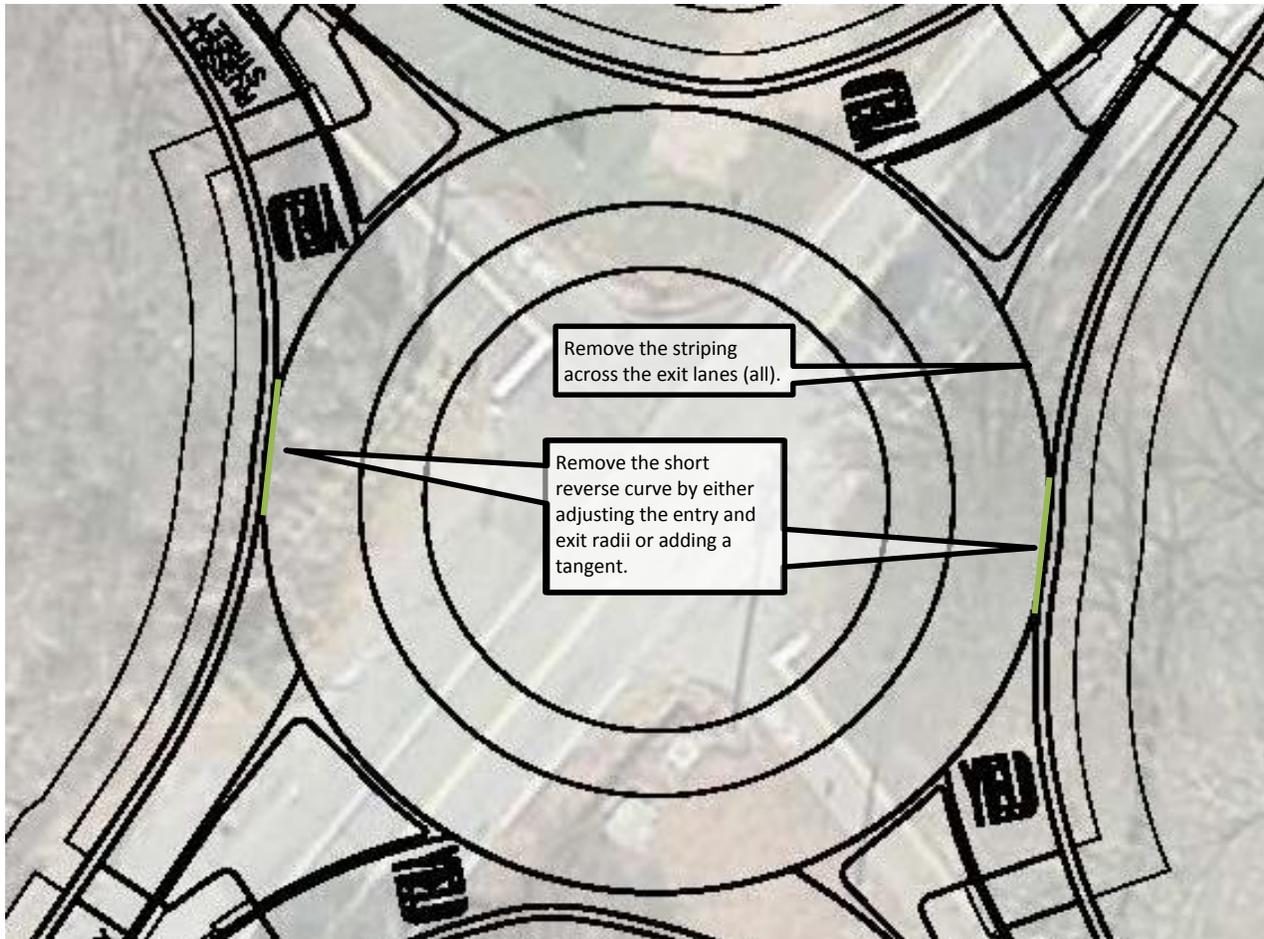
Proposed SR 13 (Buford Highway)/Russell Street Roundabout
